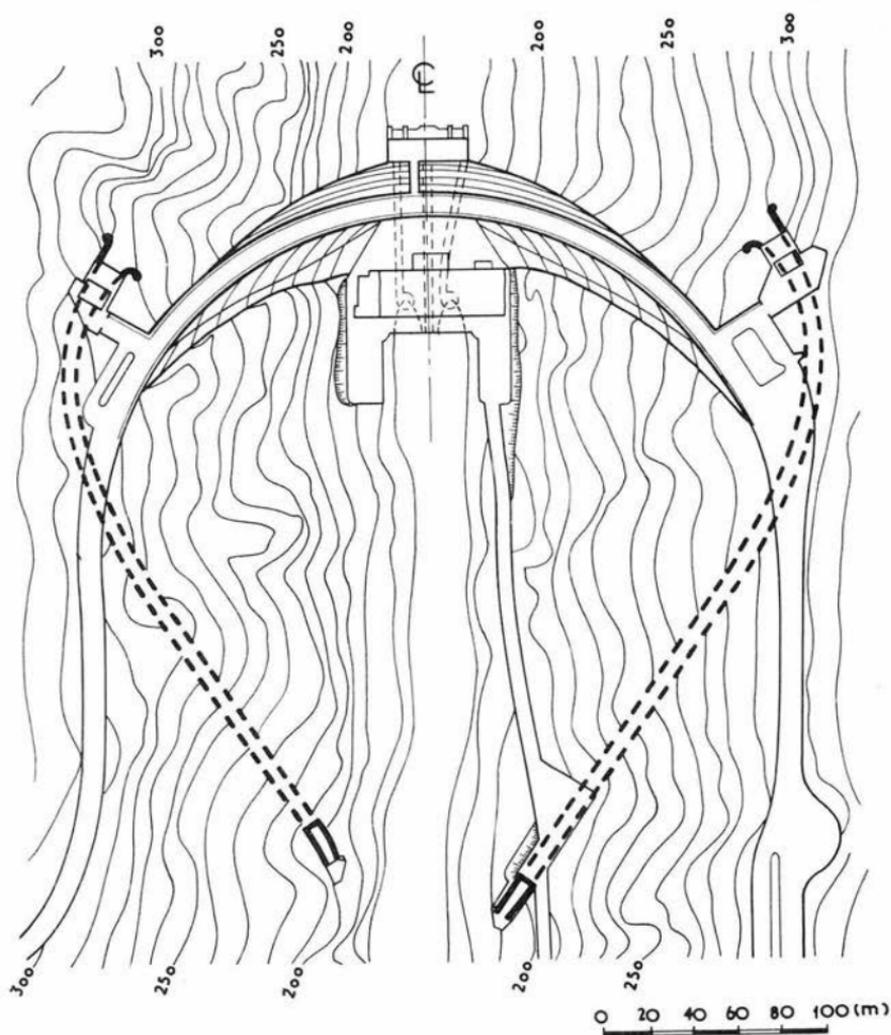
CABRIL — PLAN OF THE DAM AND SPILLWAY
